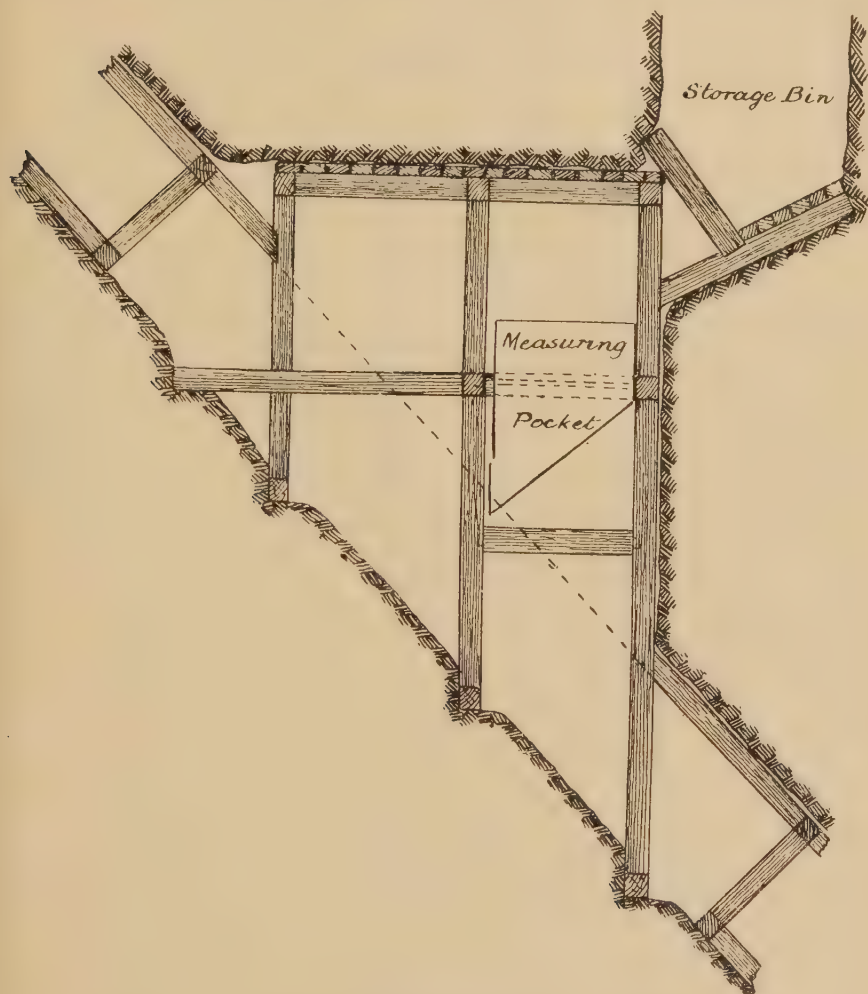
Loading-chute with measuring-pocket for inclined shaft.
